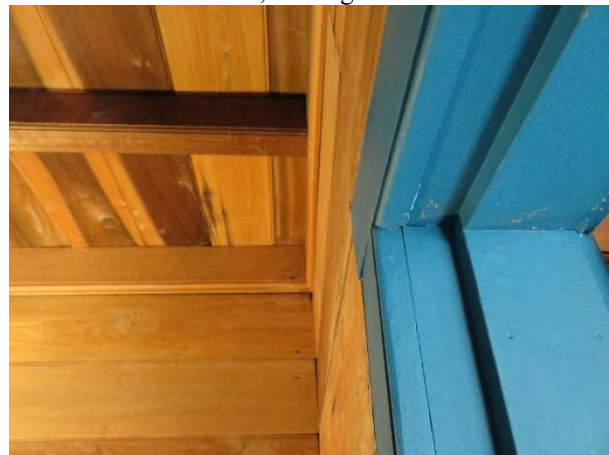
Minor separation of jamb and head trim in Room 2 (102).
